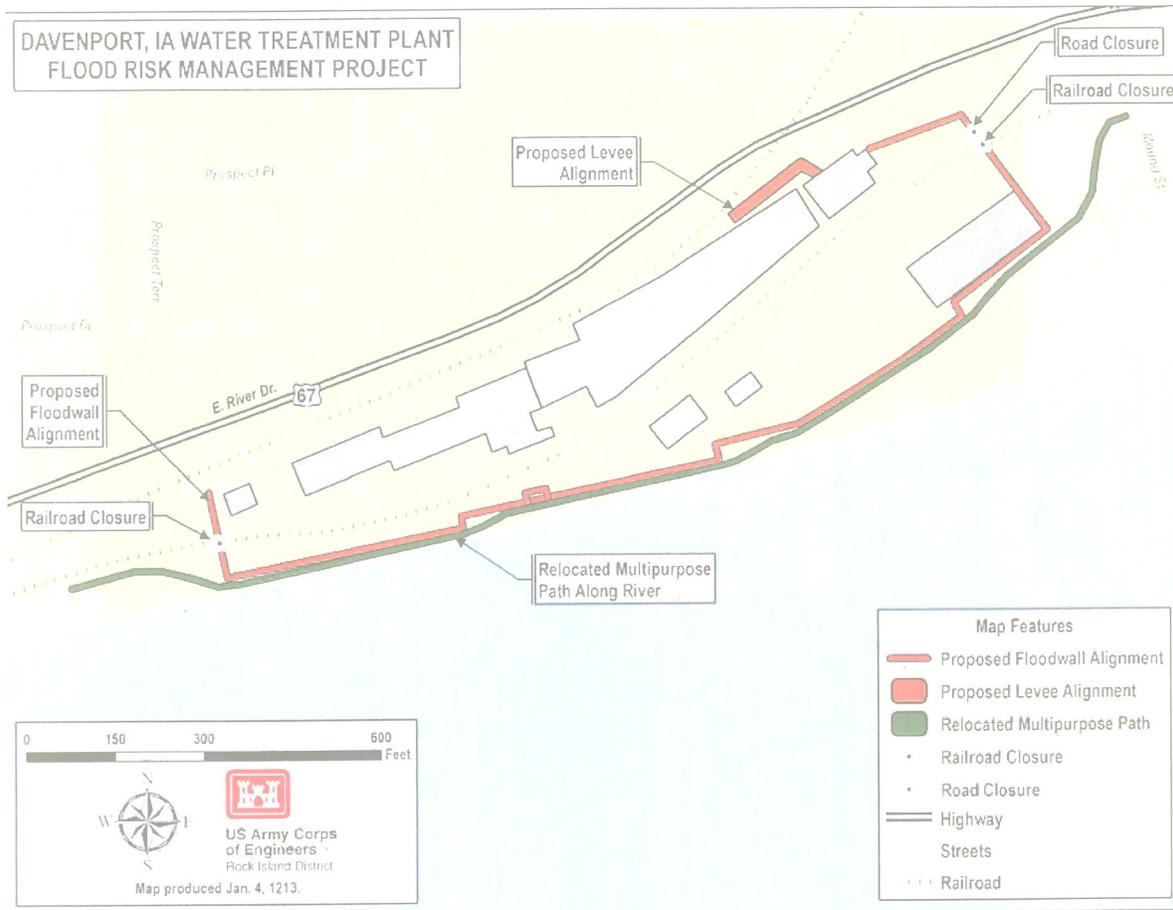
Project Site Plan Showing Various Project Components Including the Floodwall, Closure Structures, and Relocated Multipurpose Path
